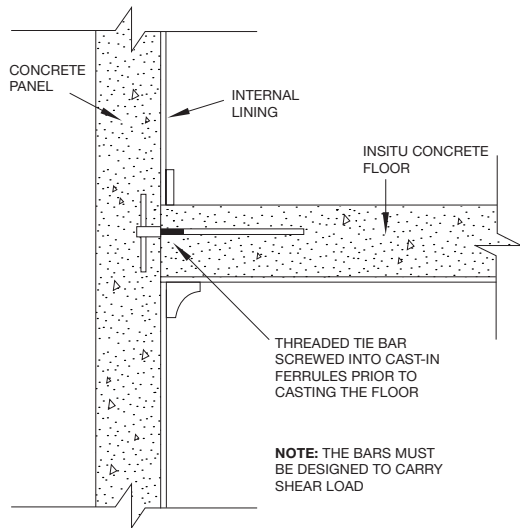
Panel to Suspended In-situ Concrete Floor Connection. (In-situ floor is supported by wall panel via cast-in ferrule and threaded tie bar)
